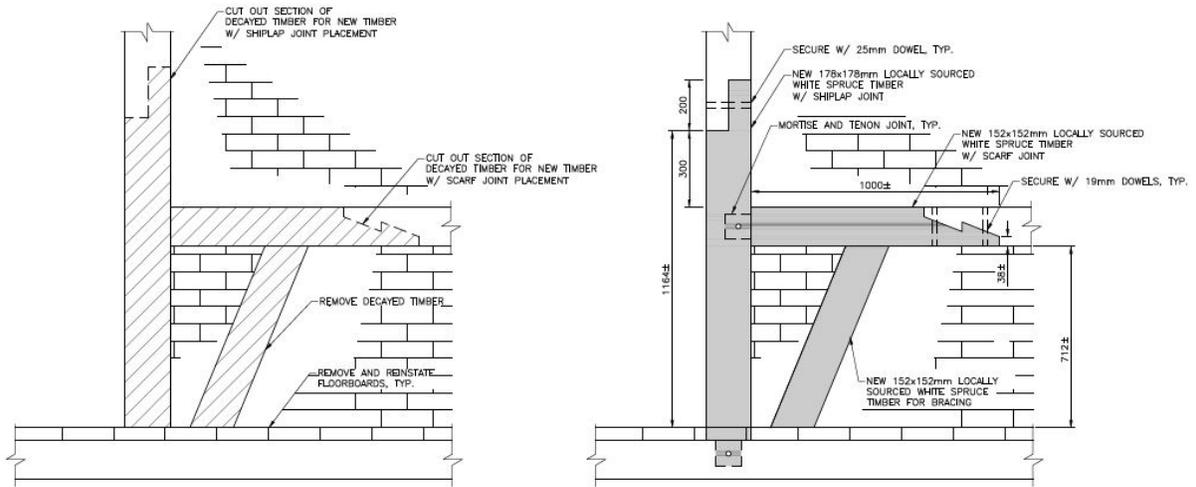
DETAIL: NEW TIMBER W/ SCARF JOINT (6)
